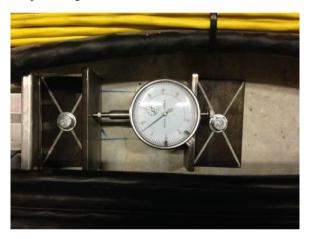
Unit 1 longitudinal beam crack monitoring.
